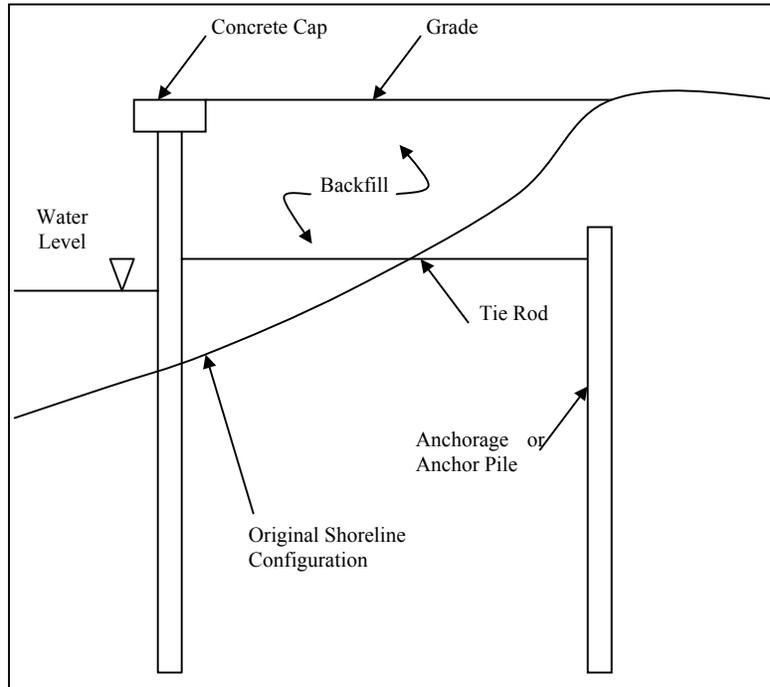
Typical bulkhead (vertical structure) cross-section.
